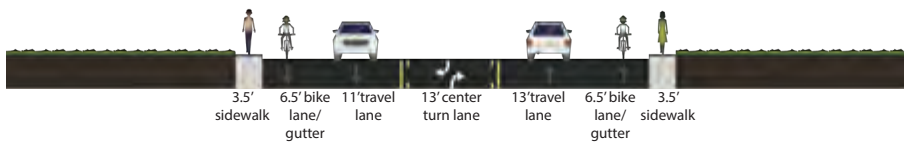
West Elizabeth Street Existing Cross Sections
